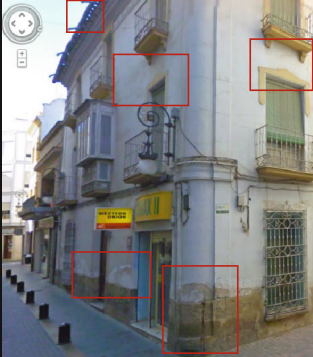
Reinforcement elements: a quoins, b plinths, c floor and wall timber ties or timber ring beams, d timber lintels, e stone frames around openings and f iron ties
